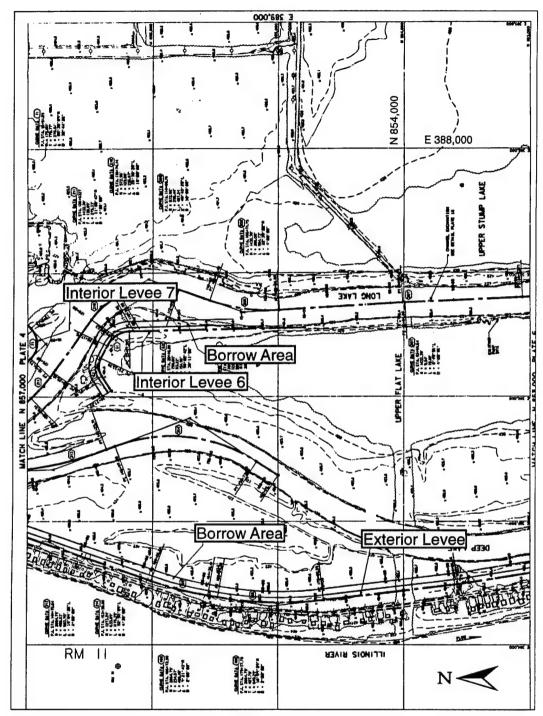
Stump Lake Complex HREP/EMP project area plan, N853,000-857,000.
